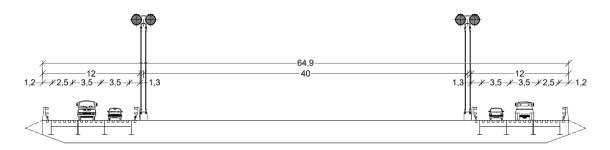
Cross-section (AA) of the simplified deck with main suspension cables spaced 40 m apart.
